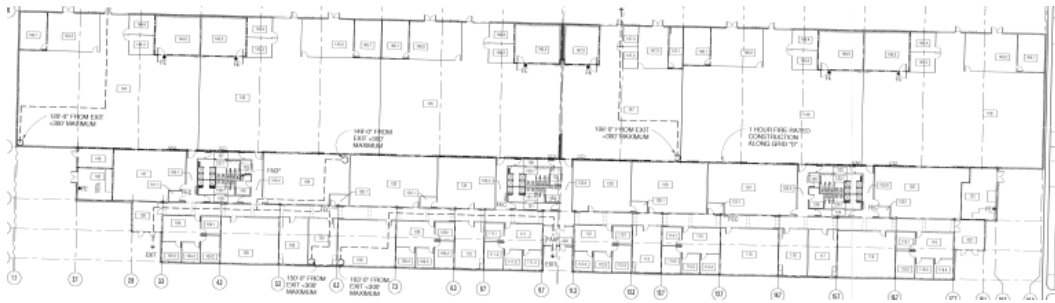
Company Operation Facility, administration offices floor plan, Bldg 2620, Fort Carson, CO.
